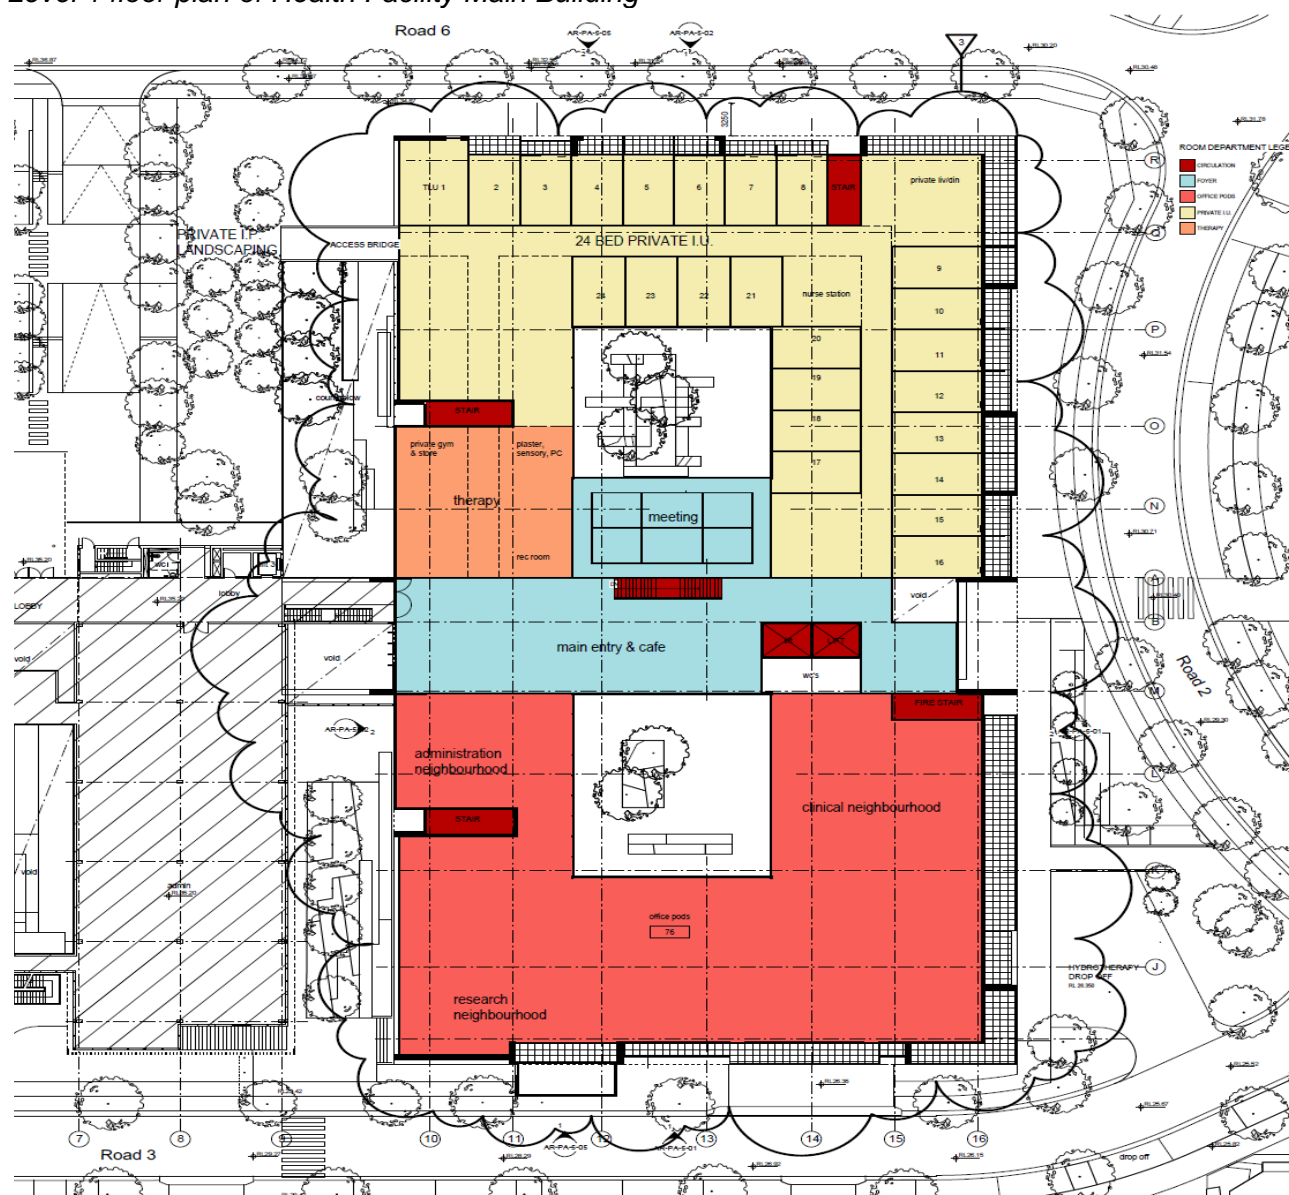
Modified Level 1 floor plan of Health Facility Main Building as contained in the Section 75W EA
